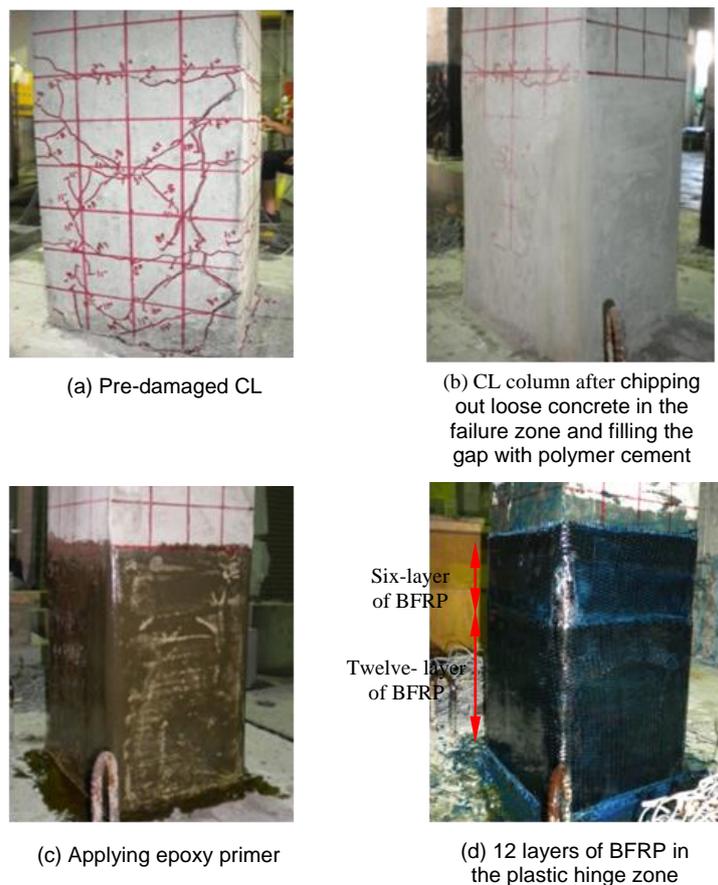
Repairing procedure of CL column using polymer cement and BFRP Jacket
